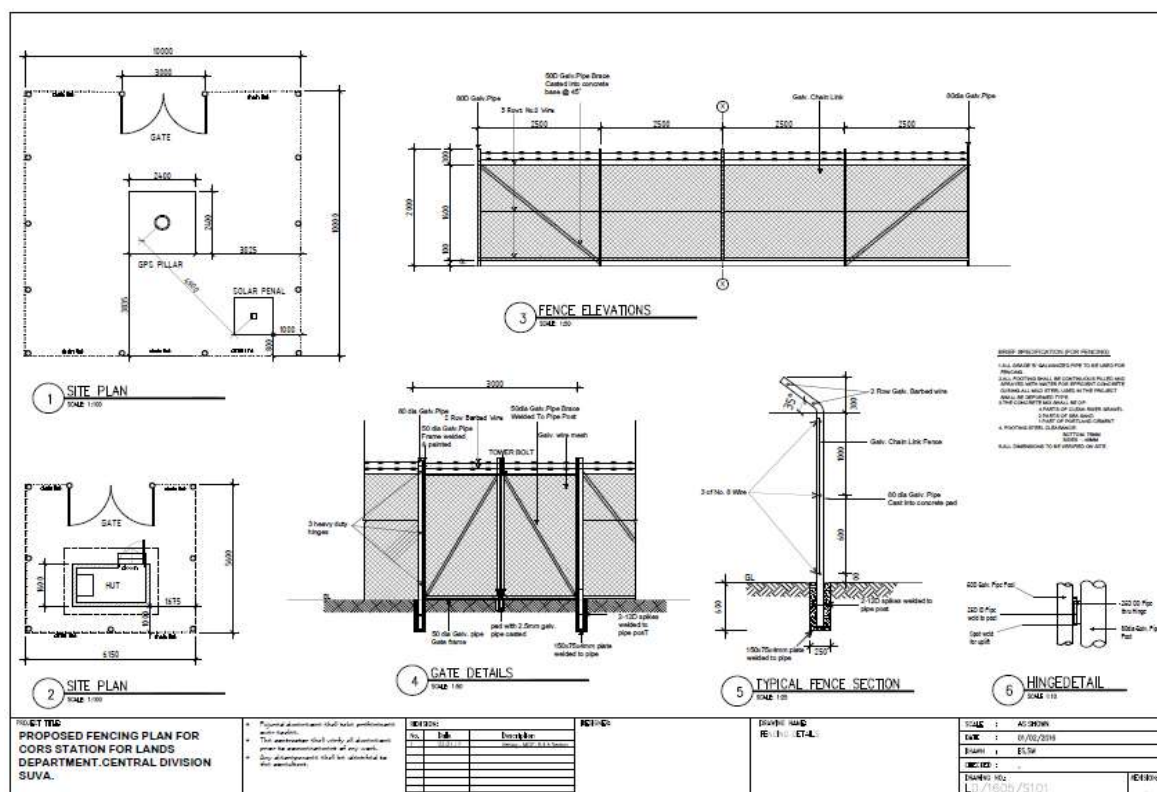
Design layout plan for the fencing around the GNSS CORS sites
